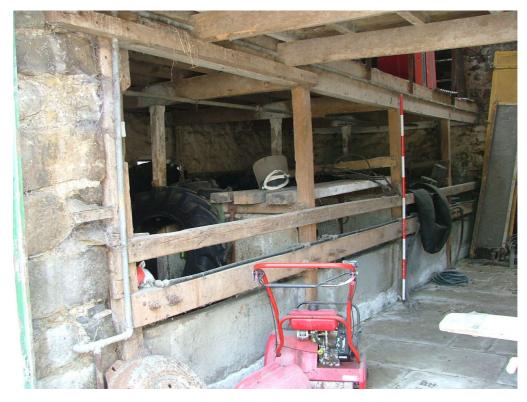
Interior of large building, Range B showing stone and timber stall divisions and stone flagged floor of central section
